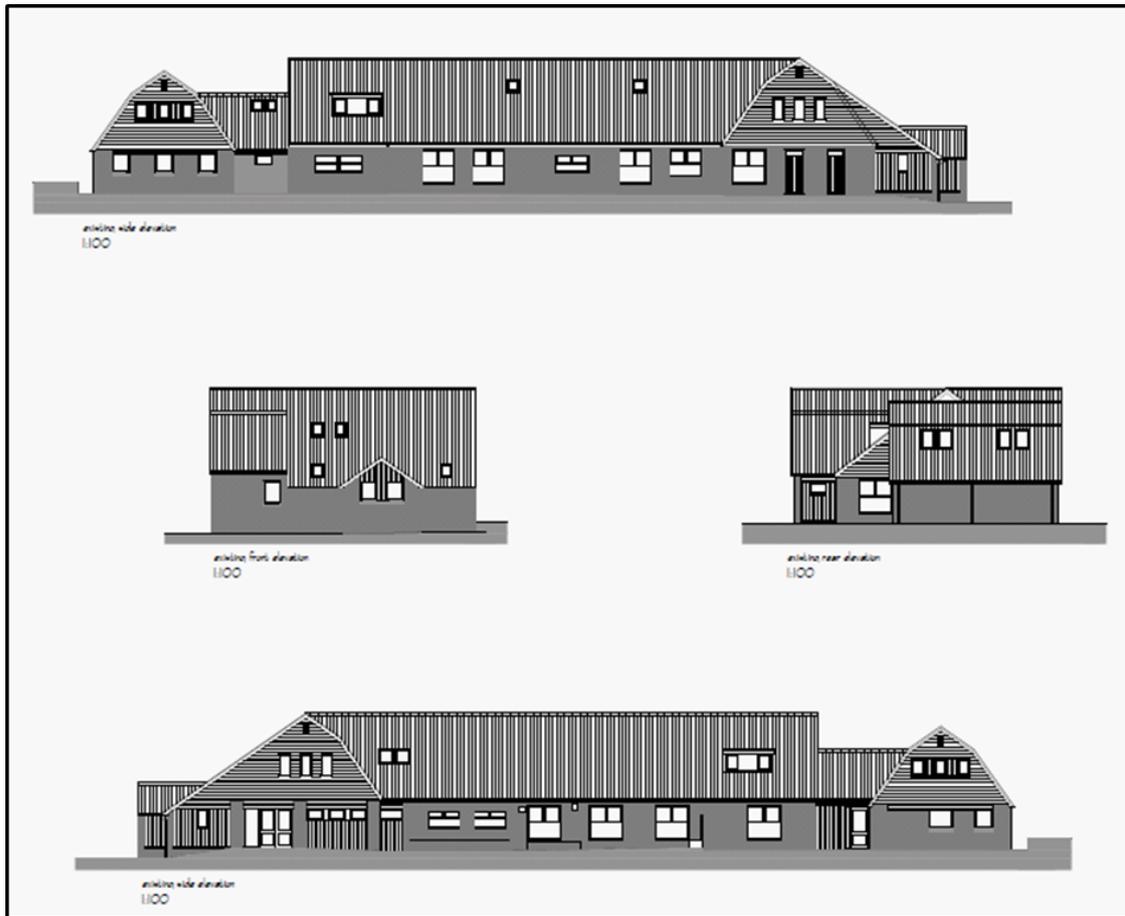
existing elevations (top to bottom clockwise) south, west, north, east)
